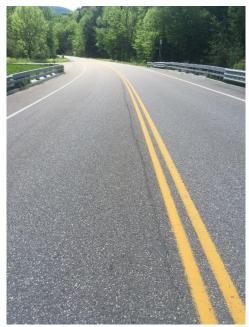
Centerline crack throughout bridge (June 2, 2016)
